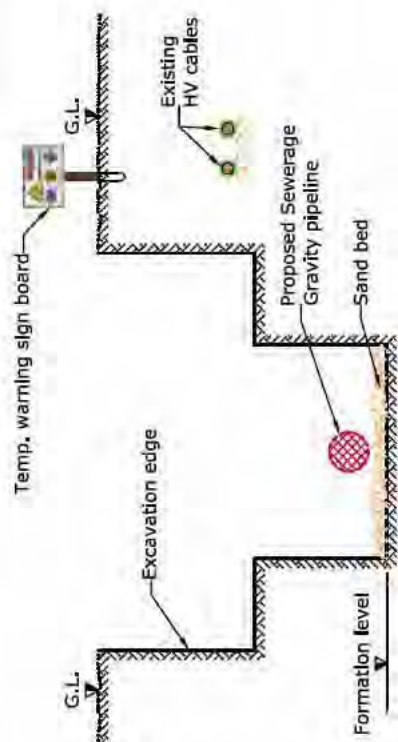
STANDARD PROTECTION DETAILS FOR EXISTING HV CABLES
